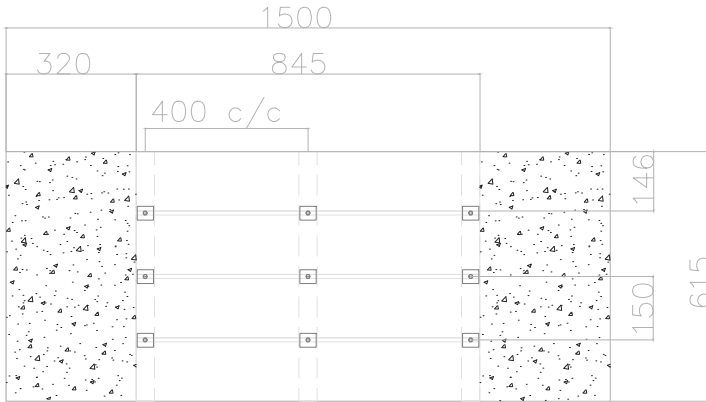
Detail 5.1-Composite timber and concrete bench in plan - not to scale (Author: 2013)
